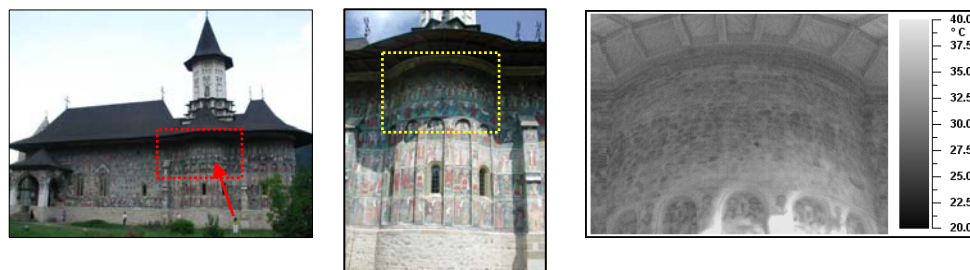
Church of Resurrection (Sucevița Monastery) – south wall
